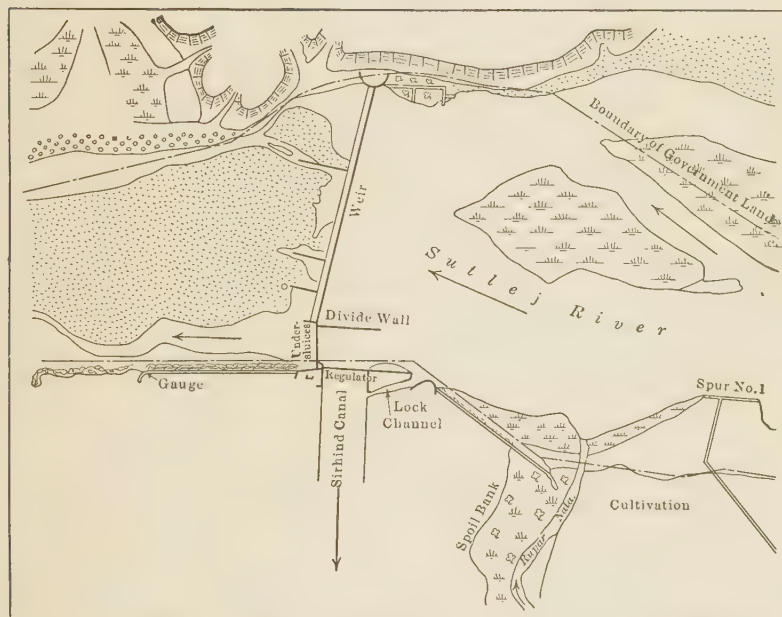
General layout for diversion works for Sirhind Canal.
